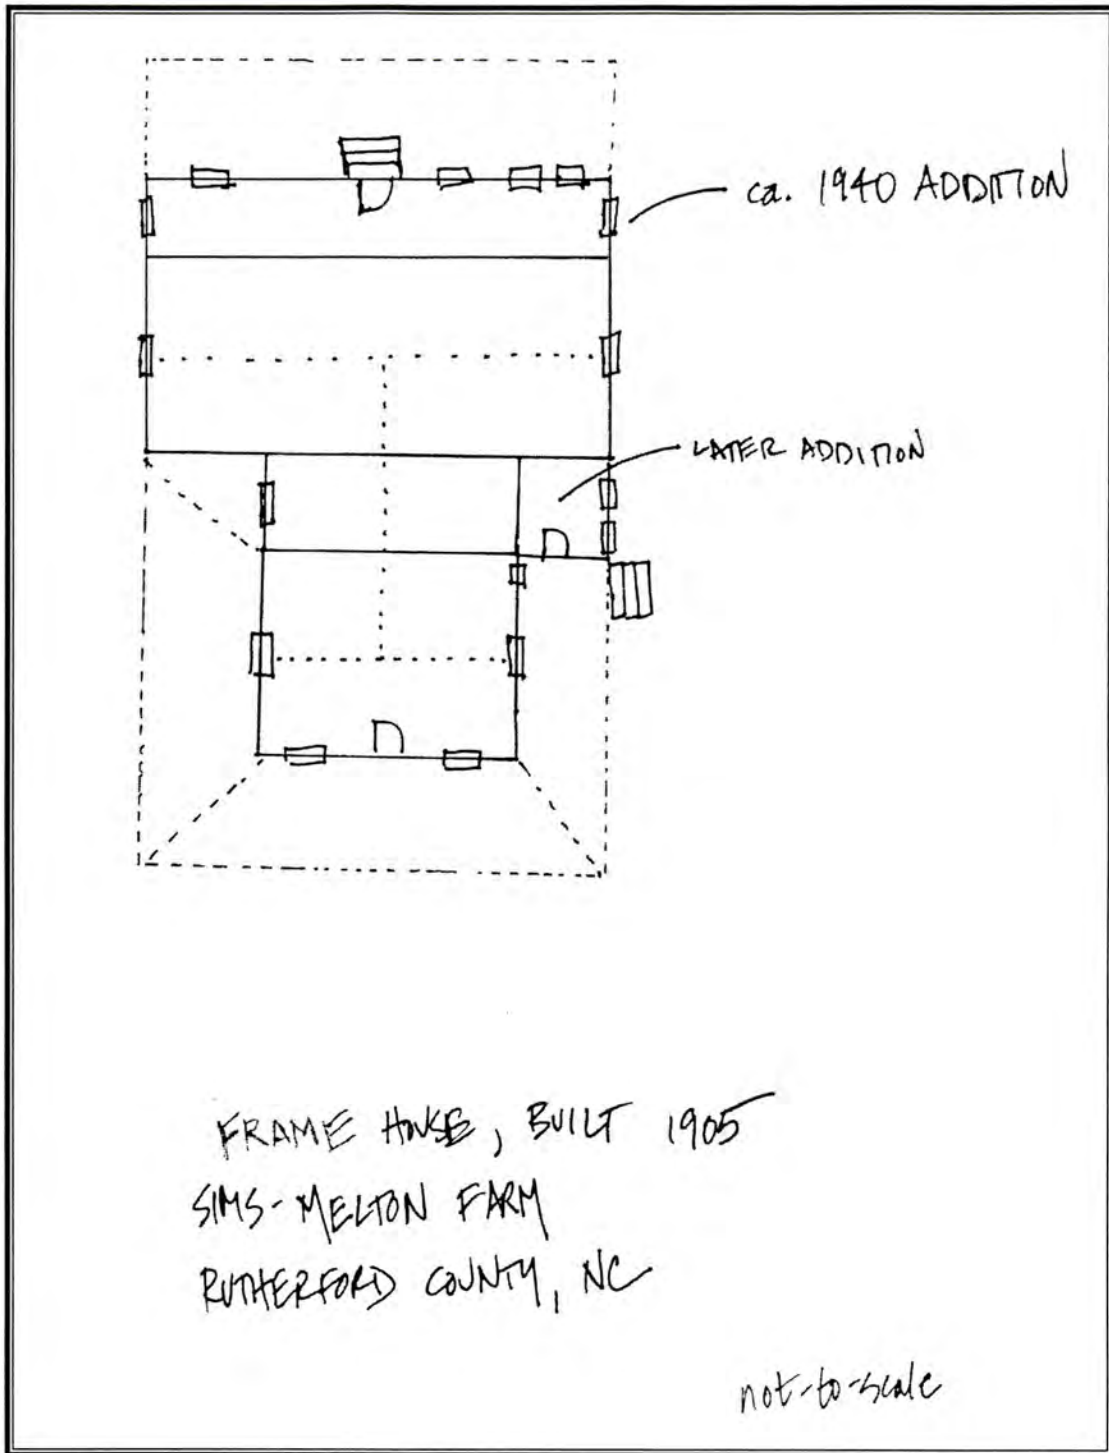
Roof Plan, Frame House, Sims-Melton Farm
